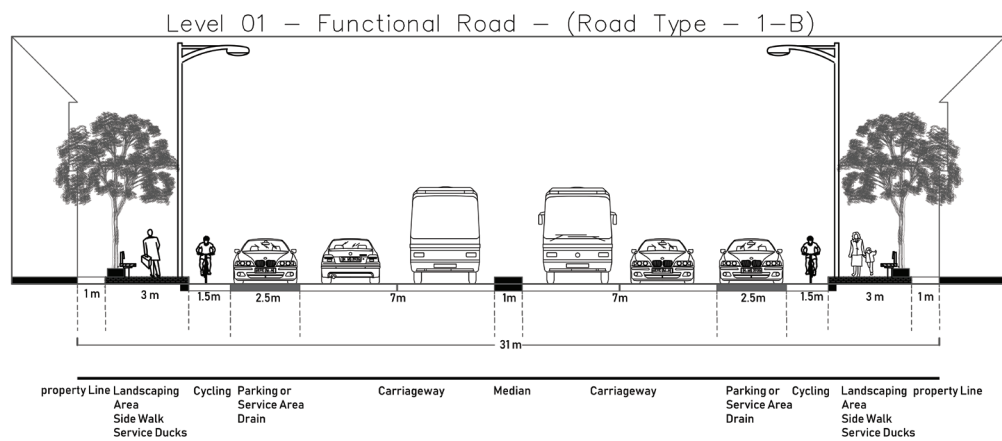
Cross section of a Level 01 – Functional Road - (Road Type - 1-B)
